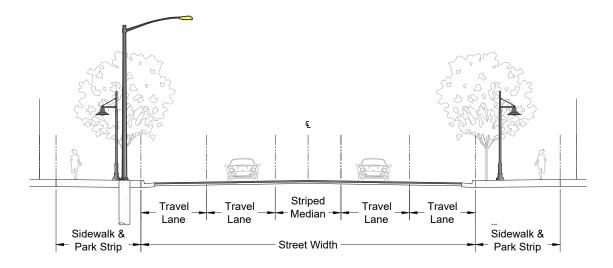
Typical Collector with Non-Continuous Pedestrian Lighting Cross Section
